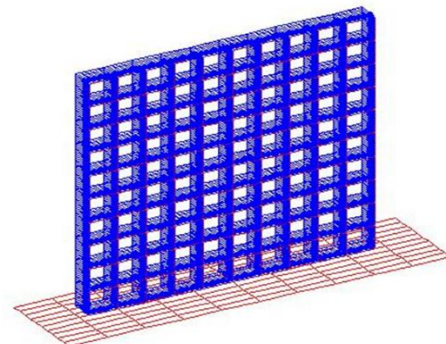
Loading diagram of CFRP two-way Hollow core shear wall without Channel shaped boundary elements
